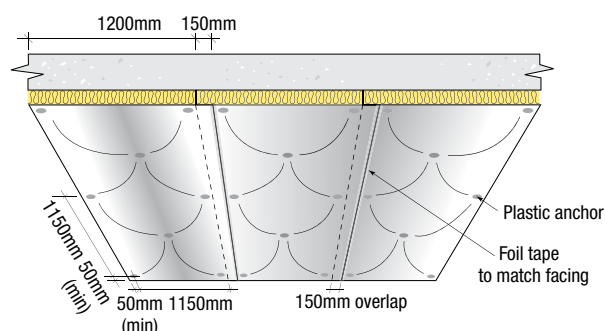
Underslab fixing – building blanket – some pillowing
